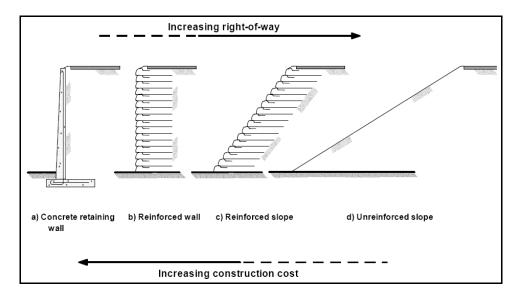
Construction Cost of Earth Structures (Zornberg, 2007).
